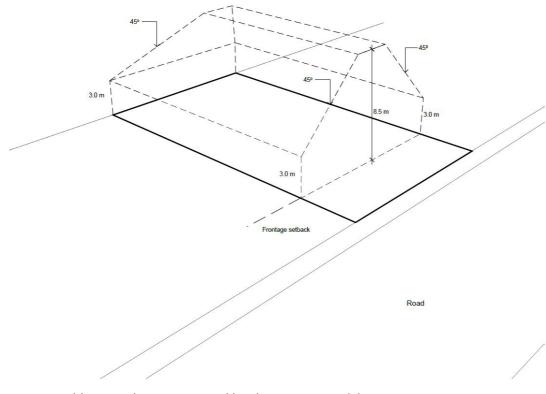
Building envelope as required by clause 10.4.2 A3(a)
